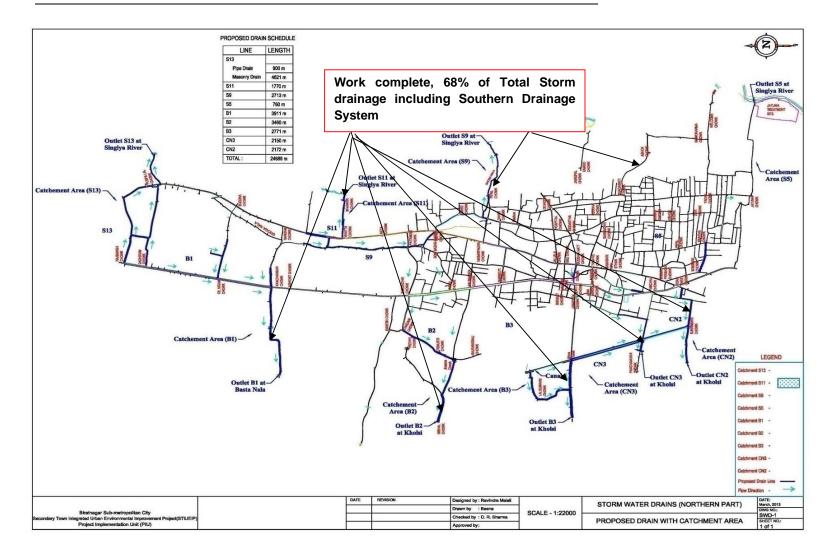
Proposed Storm Water Drains in BSMC (Northern Drainage System)
